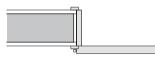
Lining and architrave (internal door, also external door in timber frame construction) rebated door leaf
